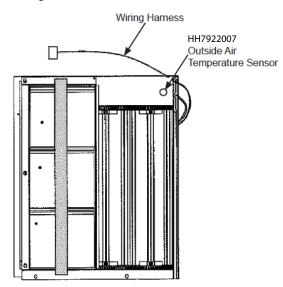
Horizontal EconoMi\$er X Component Locations
